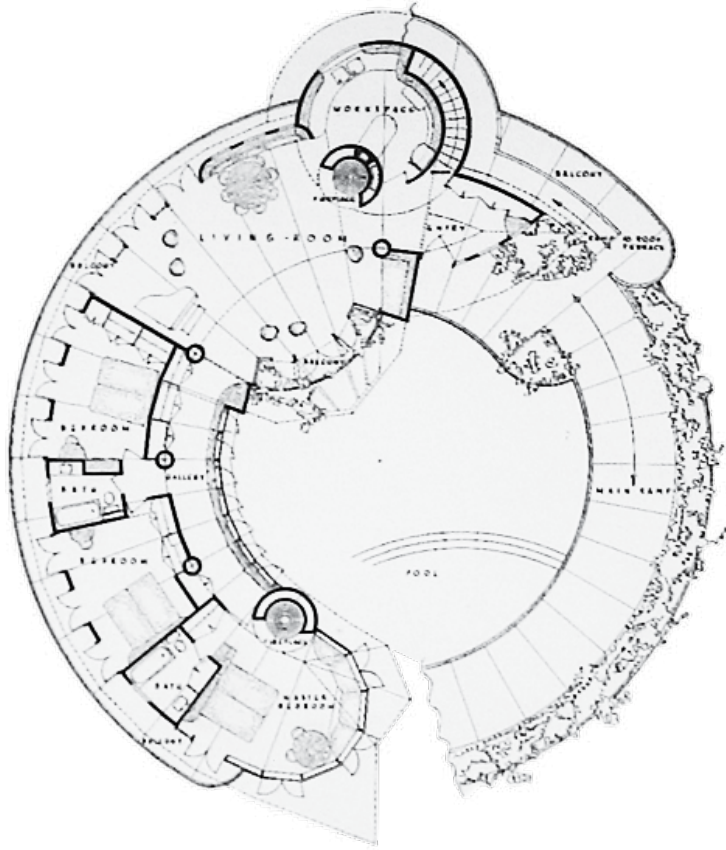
David Wright House plan depicting the circular form and courtyard.
